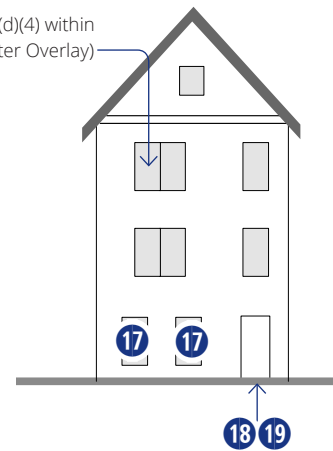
Detached House Building: Street Facade Design Requirements
